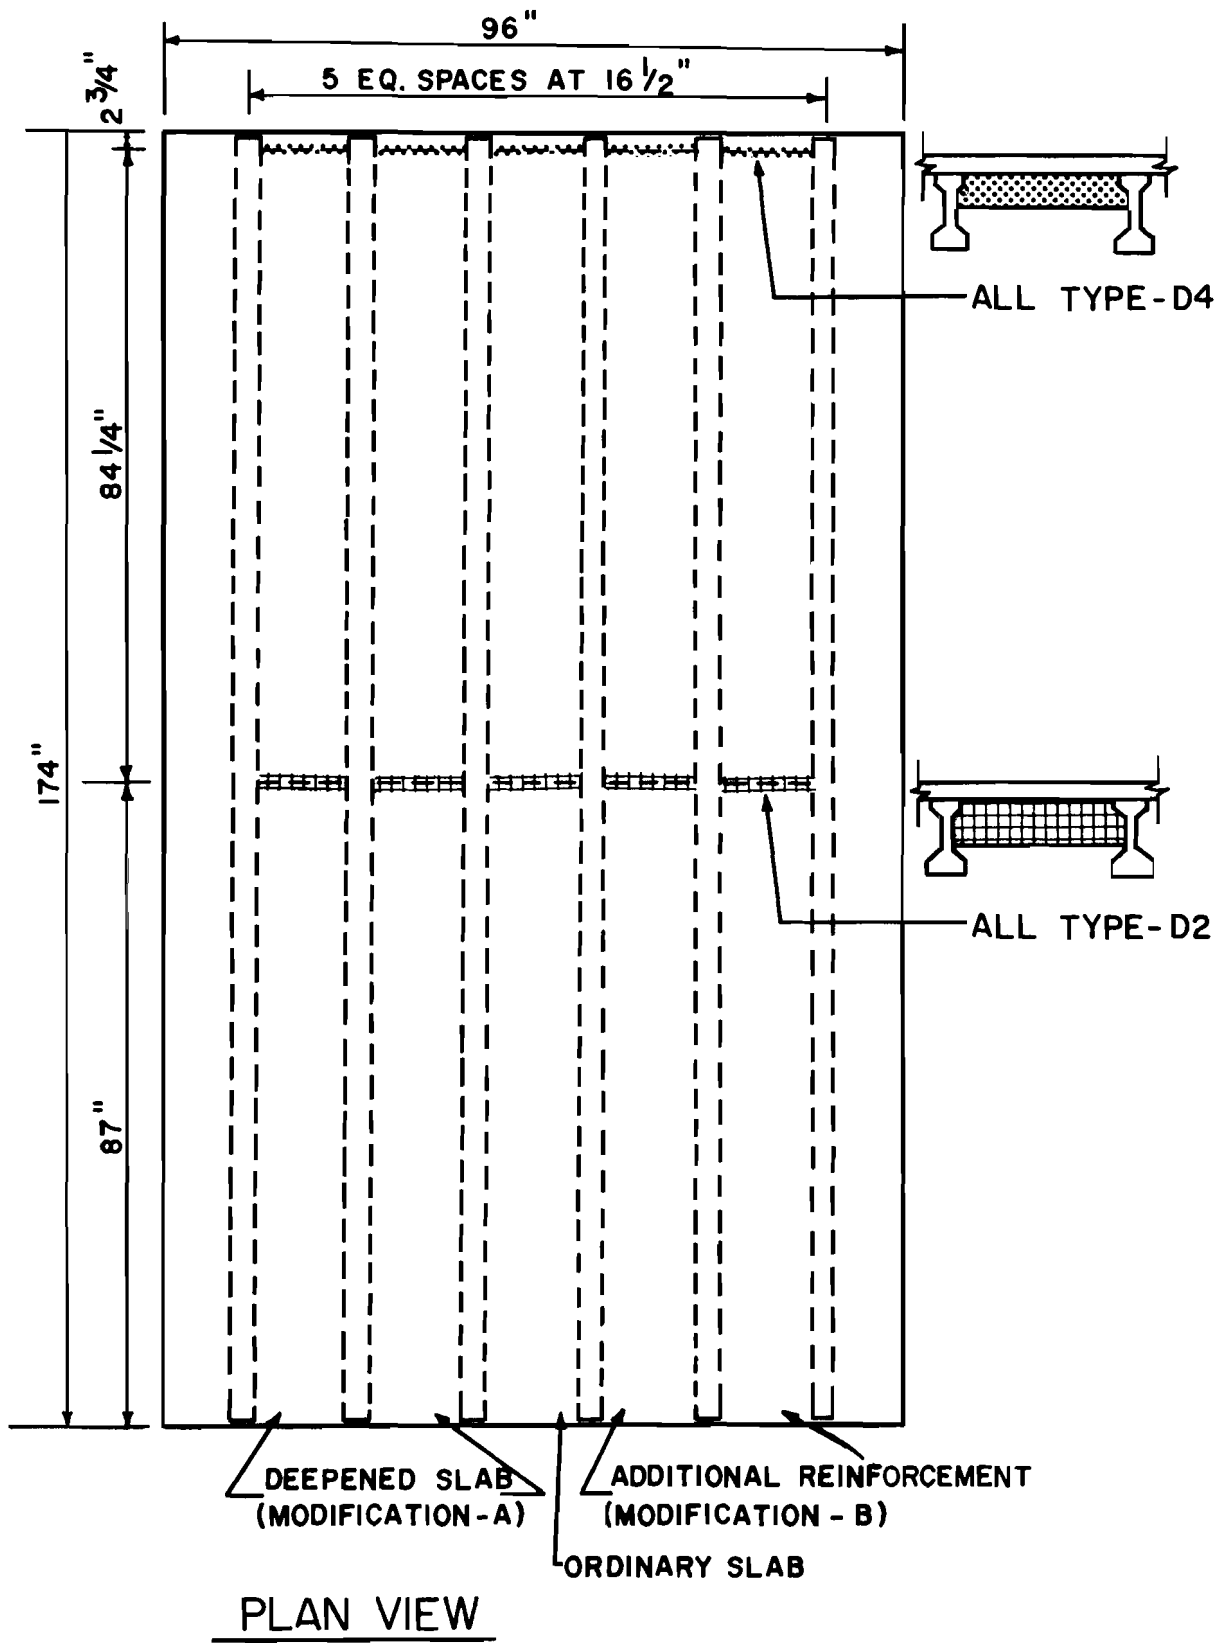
Bridge 3, general plan, diaphragm types and locations.
